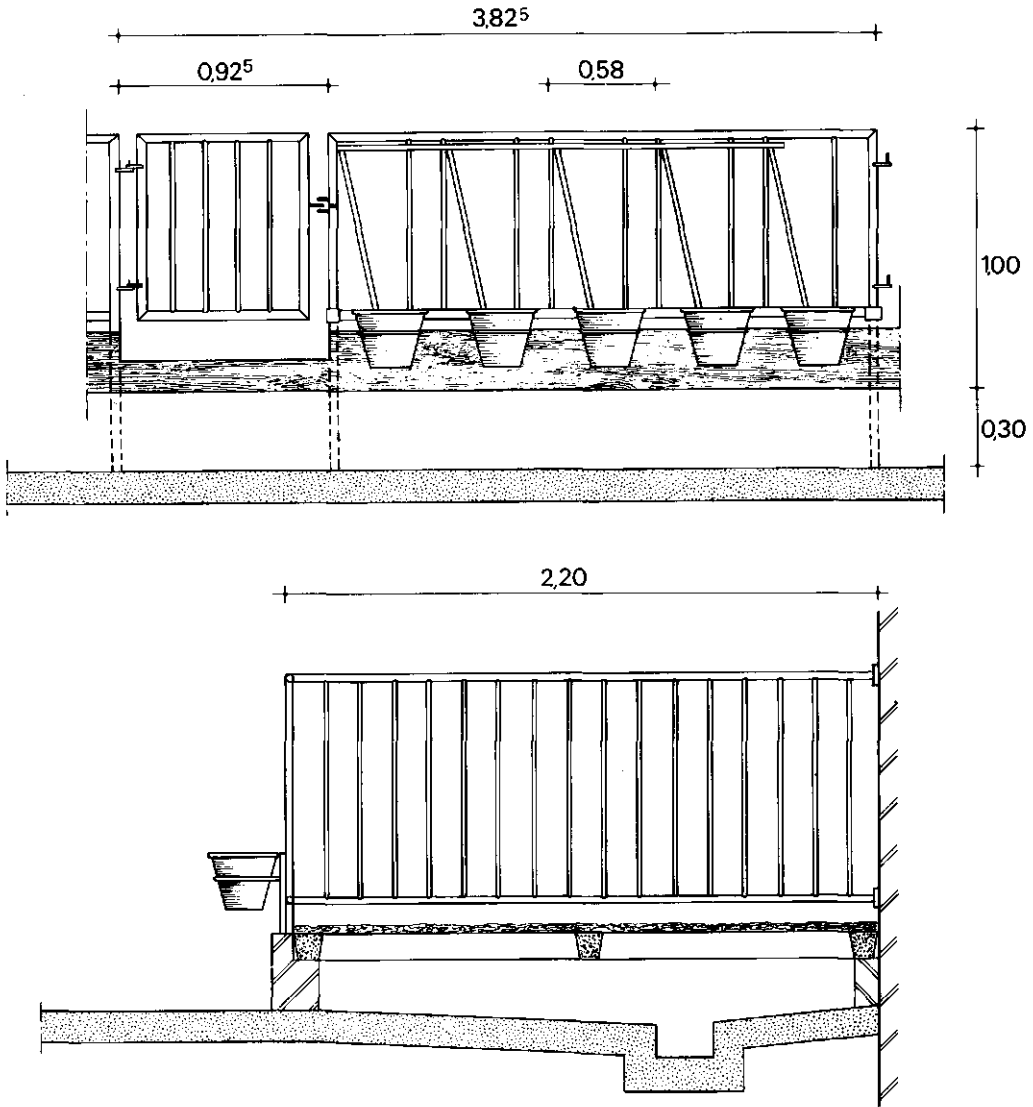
Front and side view of a group pen with straw bedding, equipped for five calves (unit I). The feeding gate is open. Dimensions in metres.
